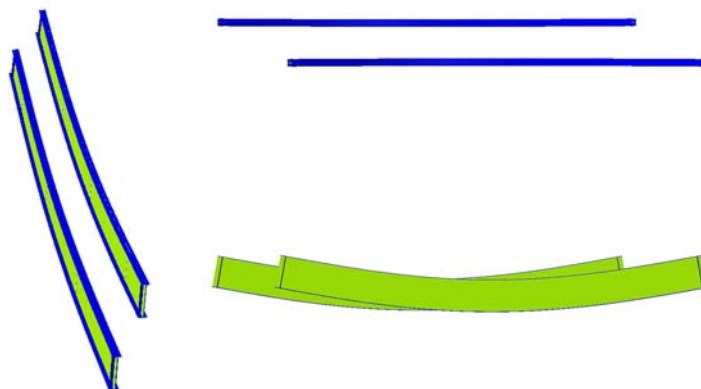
Magnified Girder Vertical Deflections for Two Simple-Span I-Girders on Parallel Skewed Supports Subjected to Steel Dead Load (SDL) Prior to Connecting the Cross-Frames
